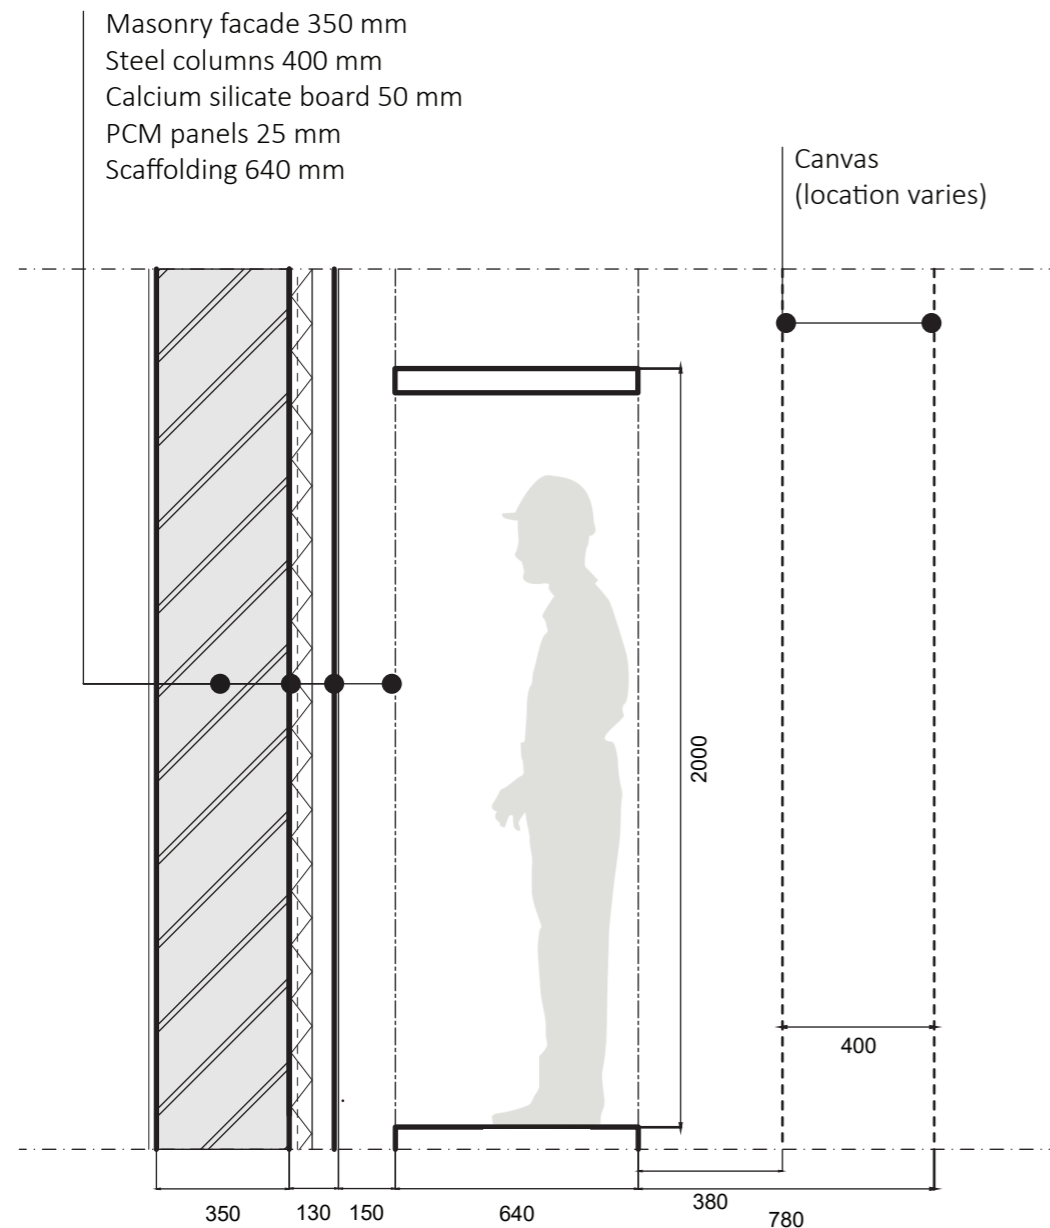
Section of facade of the Rotonde with proposed interventions on scale 1 : 20 (source: own).
